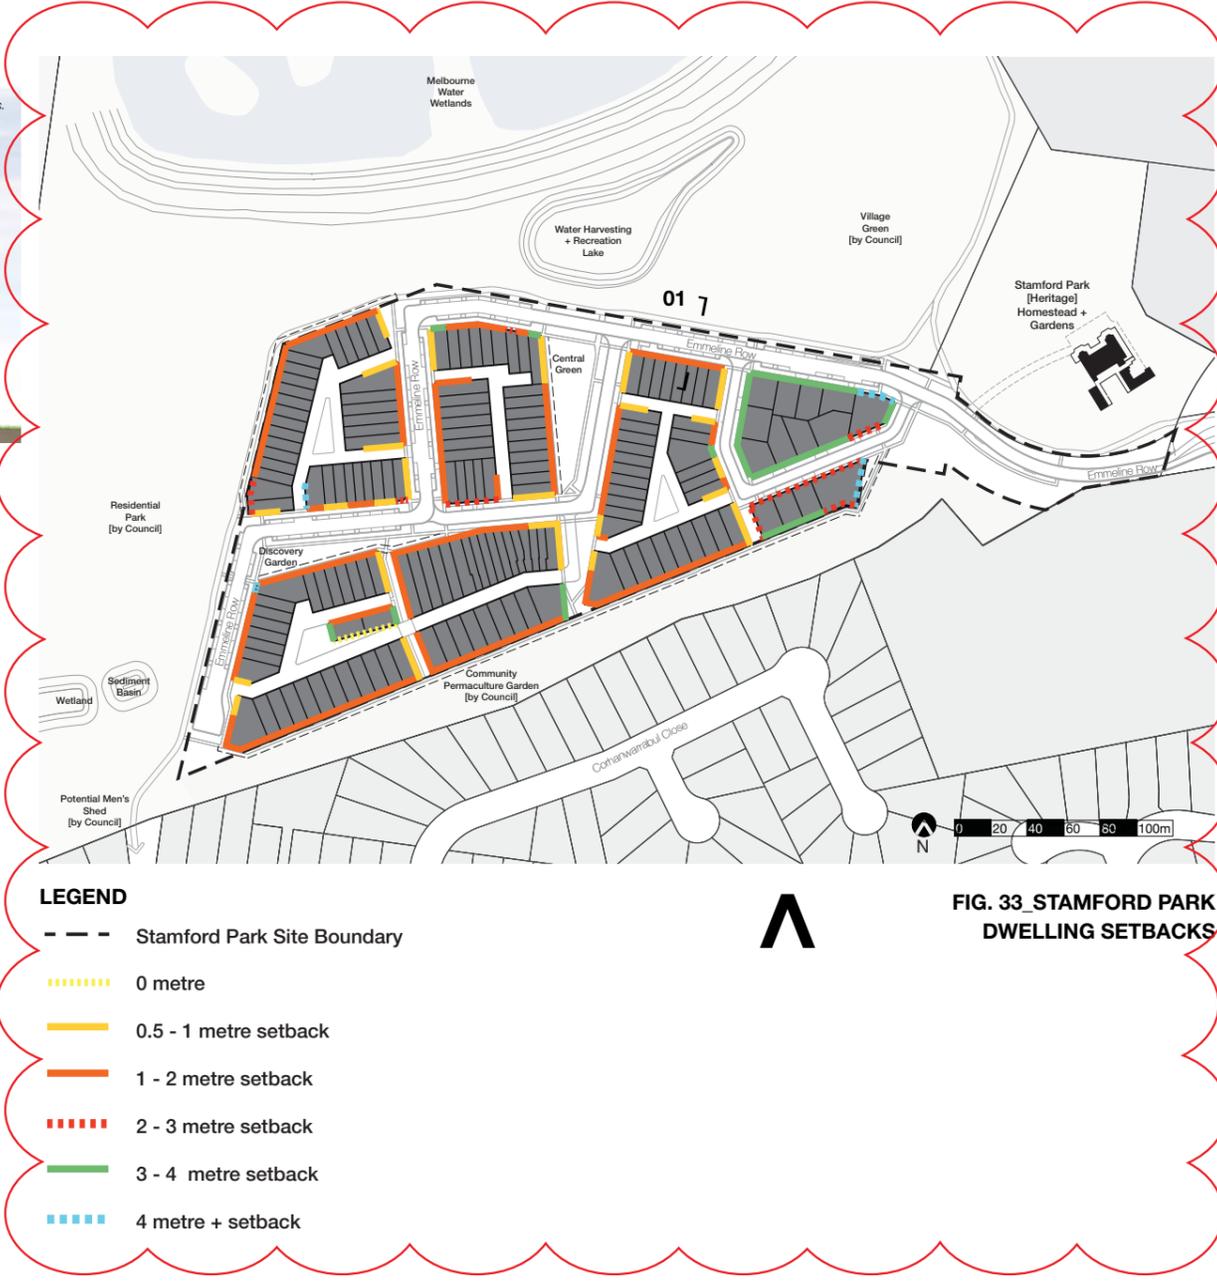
STAMFORD PARK DWELLING SETBACKS
